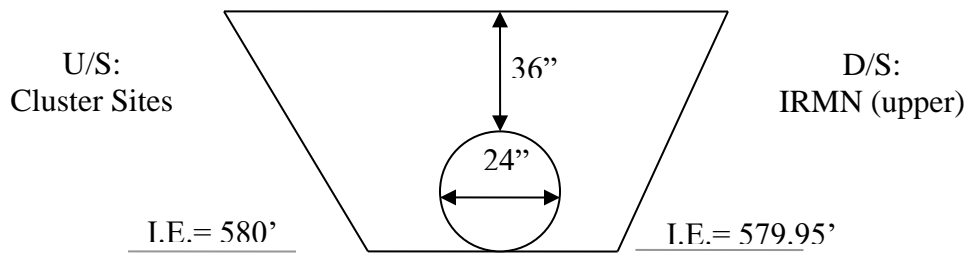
A culvert structure connecting Cluster Sites to IRMN (upper) (Structure 1).
